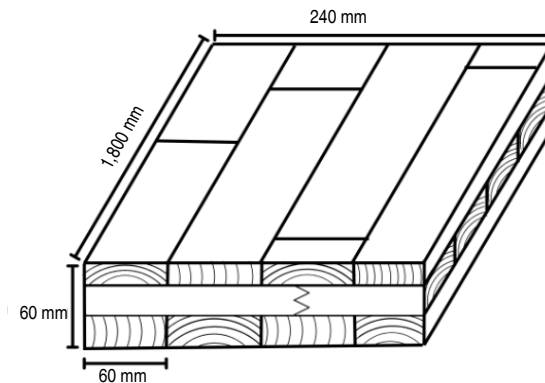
Cross-laminated timber CLT made with Finger Joint.
